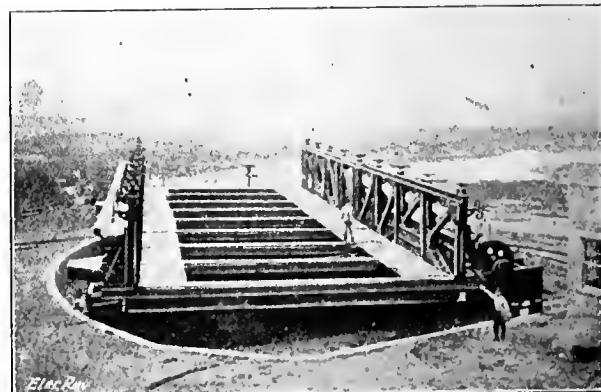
BOAT CARRIAGE ON TURN-TABLE.
